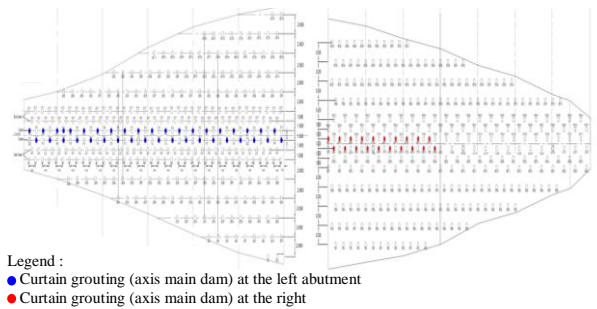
Layout of grouting holes in Bajulmati dam foundation
